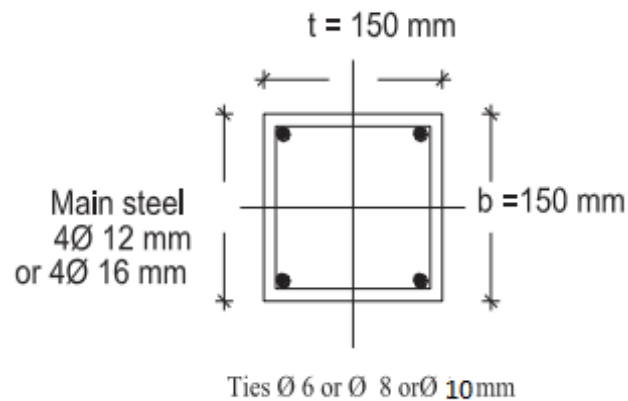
Cross section and reinforcement detailing of column used for validation
